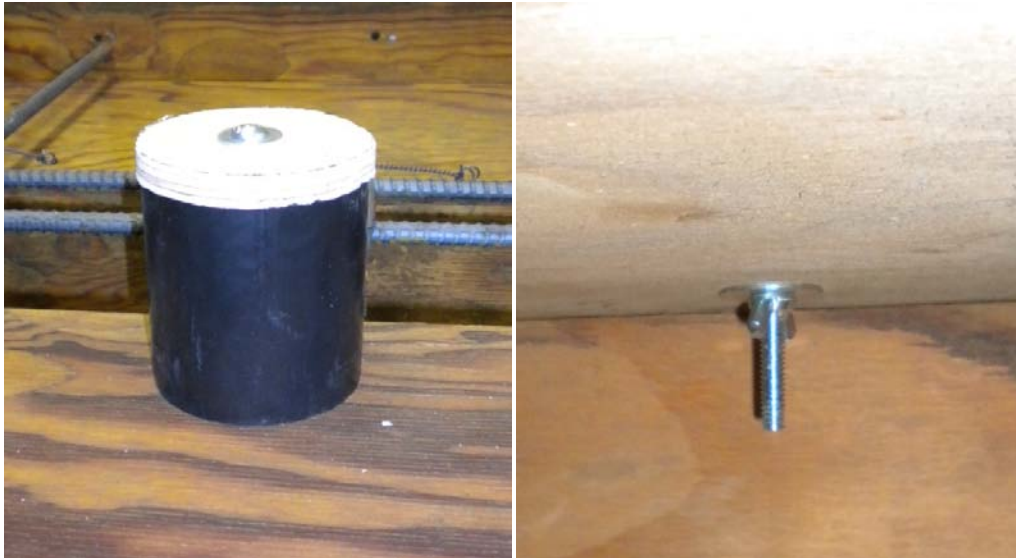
Flange Void Forms (a) 75 mm PVC Piping, (b) Bolt and Wing Nut Underneath Formwork.
